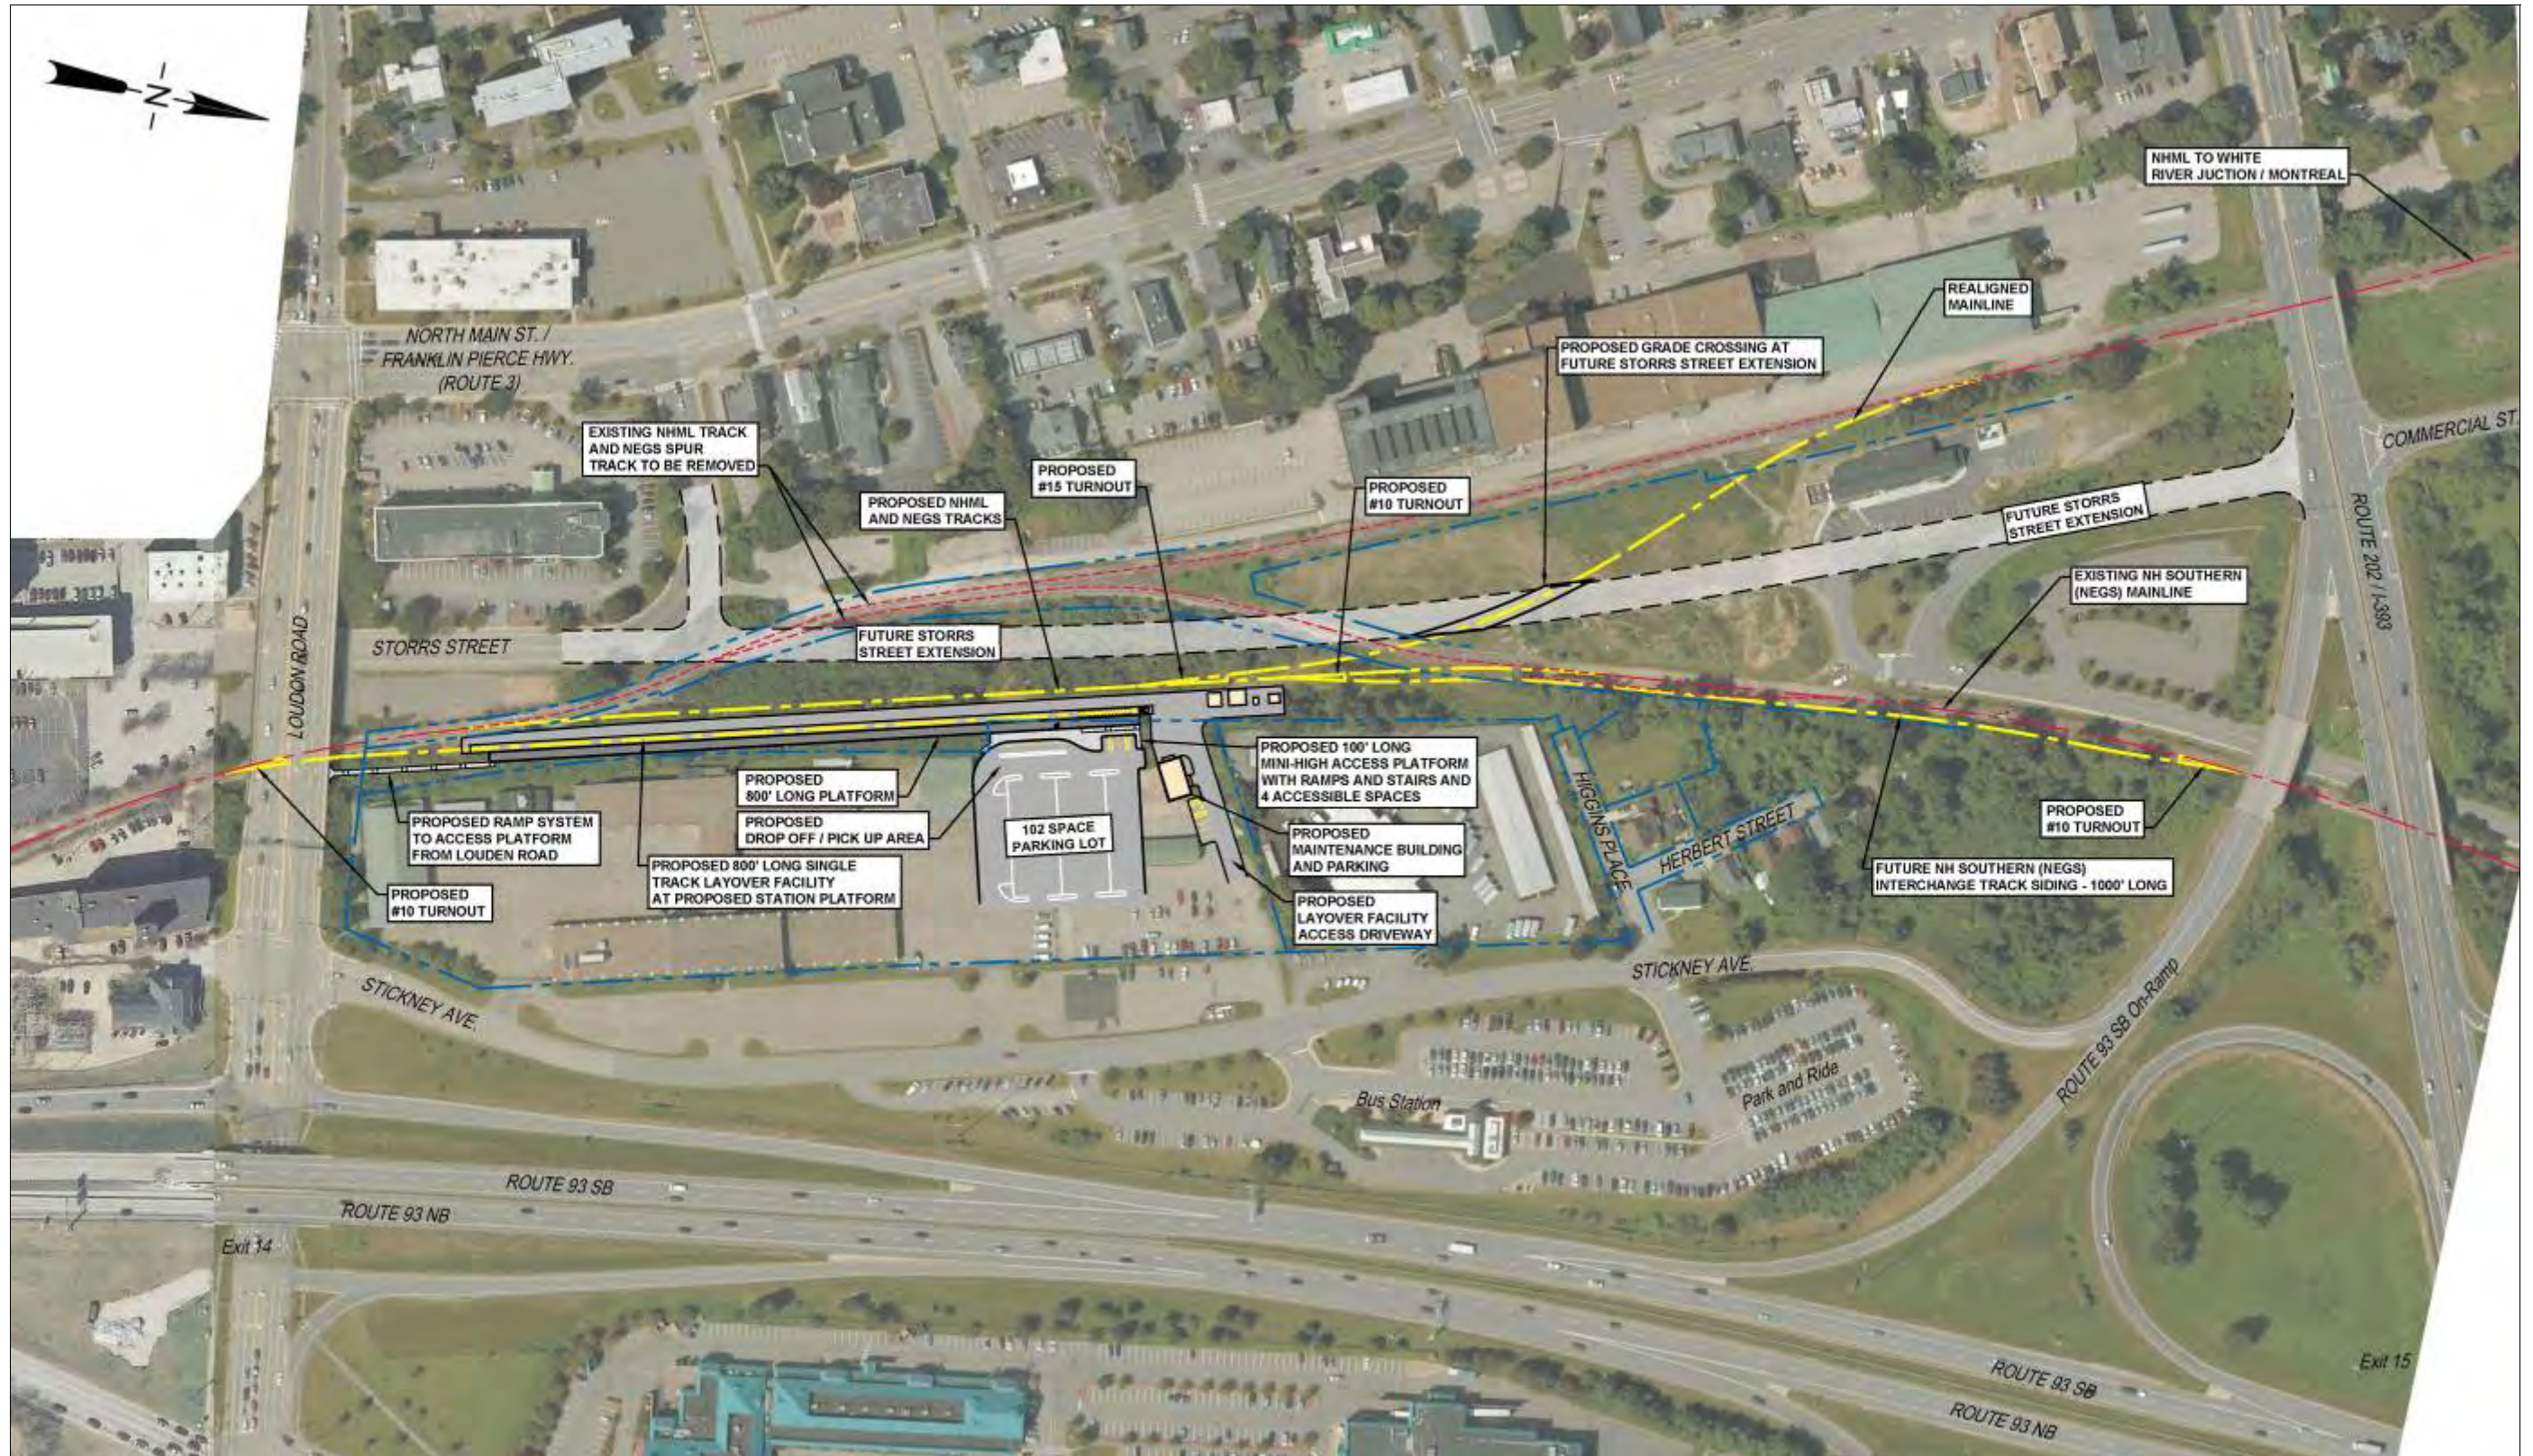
Plan drawing of the proposed Stickney Avenue Station.
